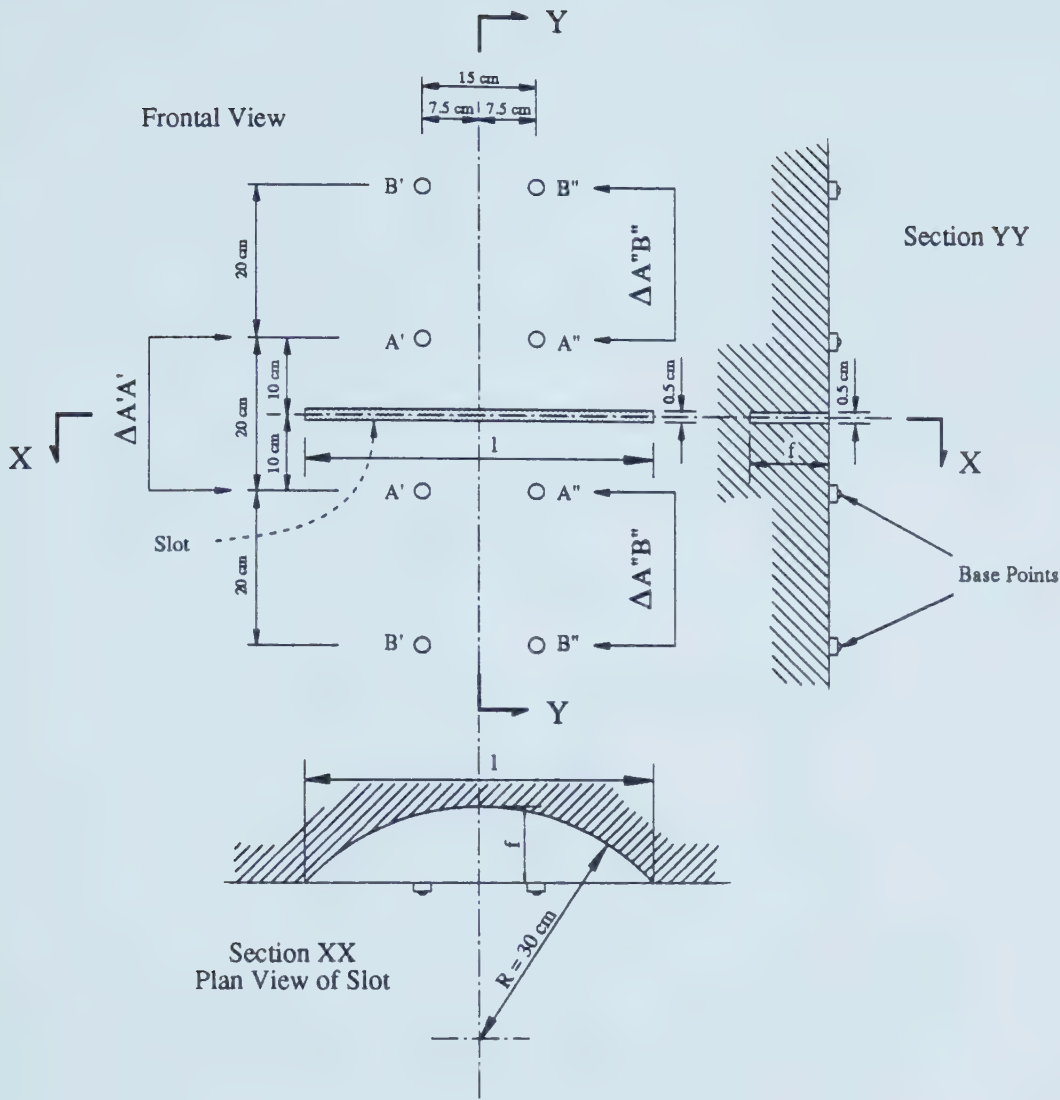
Layout of LNEC Flat Jack Test (modified from Rocha et al., 1966)
